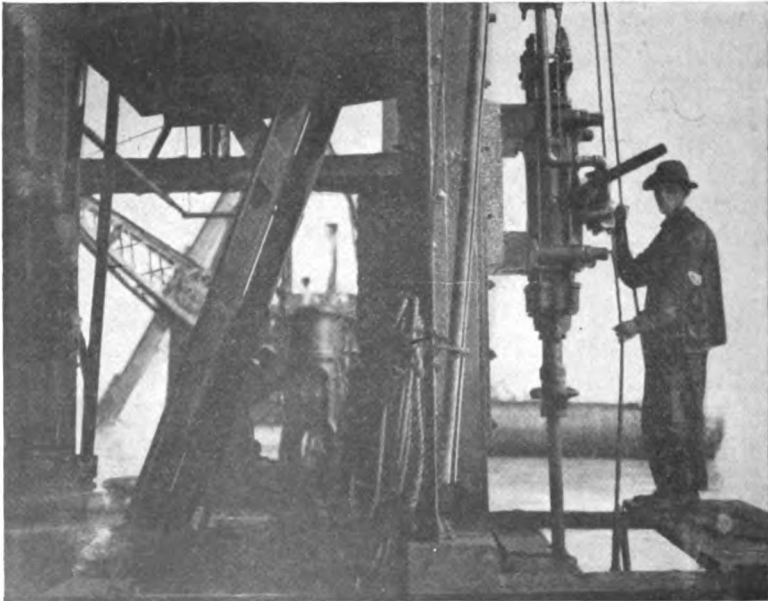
Drill and Drill Frame: Drill Boat "Destroyer."
